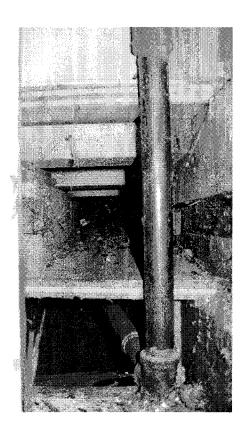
Floor framing for kitchen area. There are two raised floors at the kitchen area, both above the level of the main area at the first floor level.
